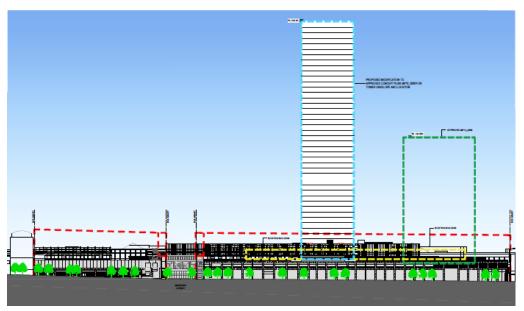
Proposed Campbell Street elevation with previous approved tower in green dashed line and proposed modification to tower envelope in blue dashed line. (Scentre Group 2018)
